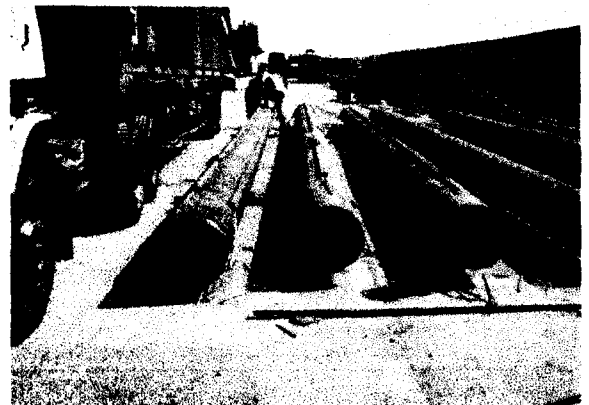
View of protection channel welded on the surface of pipe pile
